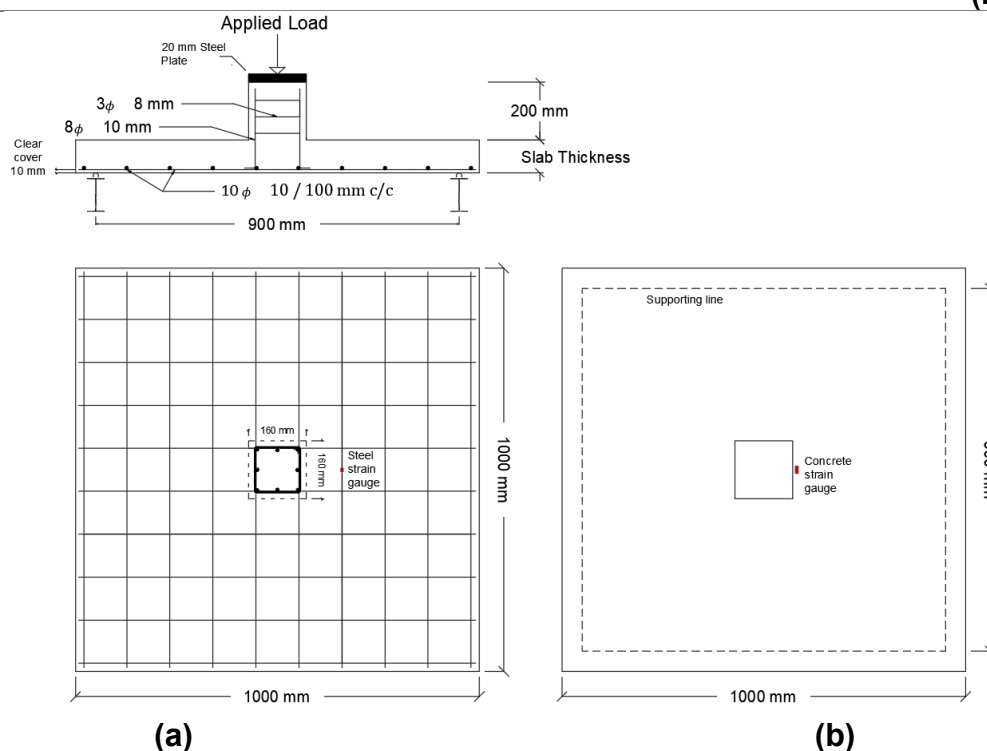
Illustration of the typical details of tested specimens (a) reinforcement arrangement and location of steel strain gauge, (b) concrete strain gauge and the boundary condition
